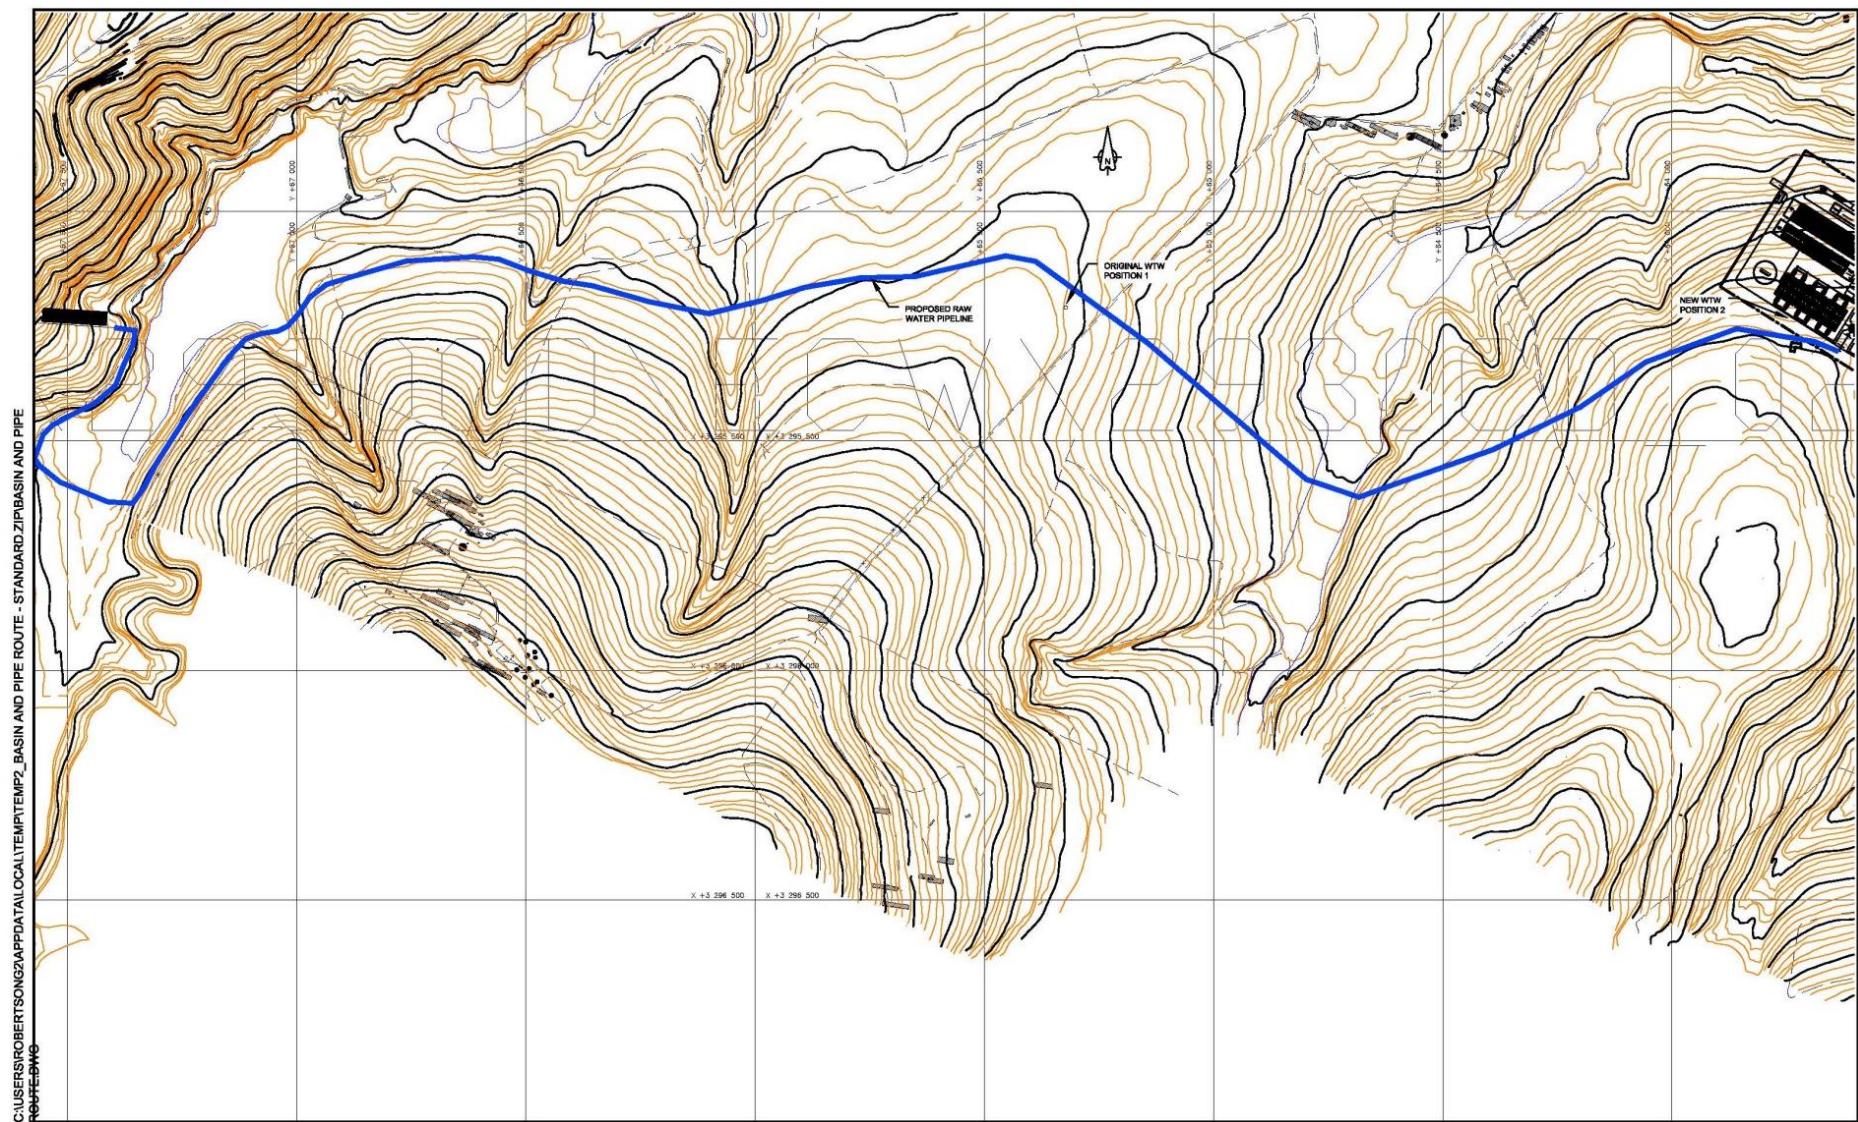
C.1: General layout of the raw water pipeline from tunnel outlet to Baynesfield WTW
